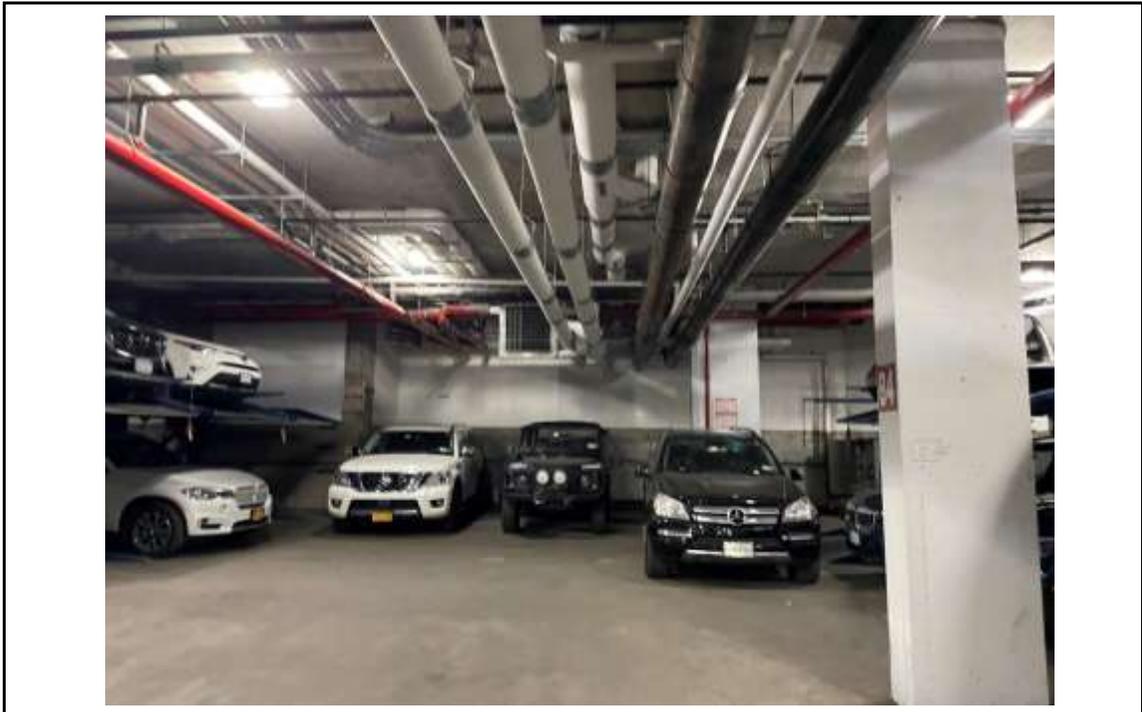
Subgrade parking garage concrete slab, facing northwest. 20 June 2022.
